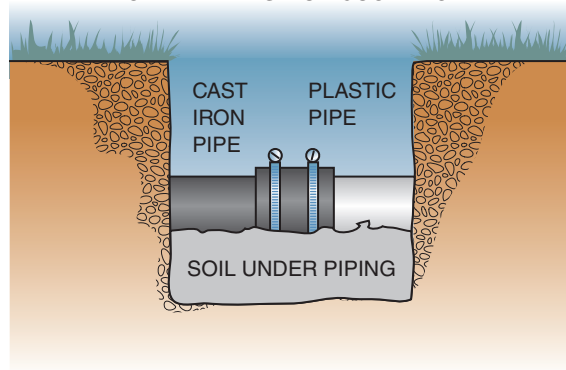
Dissimilar pipe connections are performed using approved connectors.
